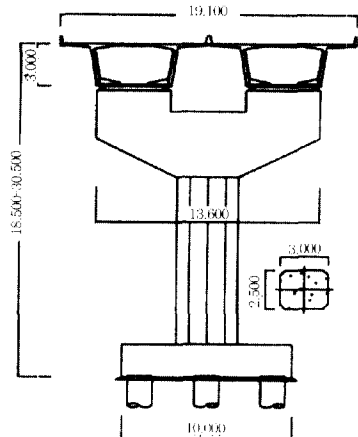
Typical cross section of the intercity bridge surrounding Pusan harbor
